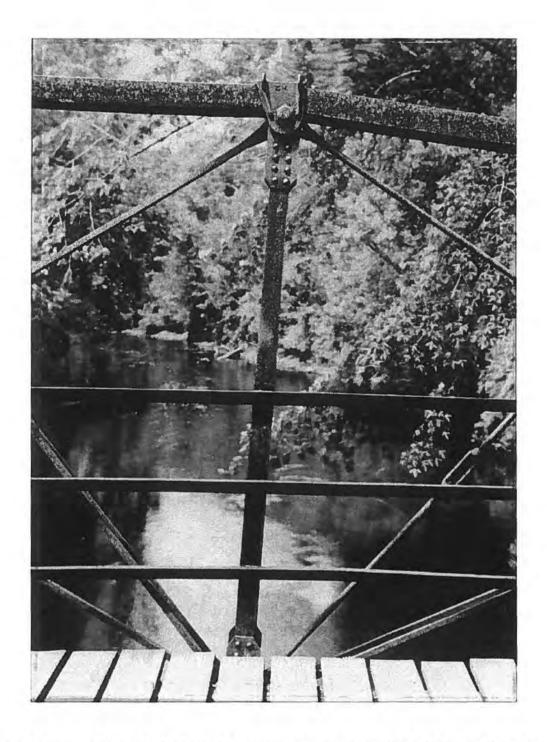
Detail of Charles M. Horton's patented, hanger hook-clip; McGilvray Road Bowstring Truss Bridge No. 1, Van Loon Wildlife Area, La Crosse, Wisconsin. (Source: HAER No. WI-22).
